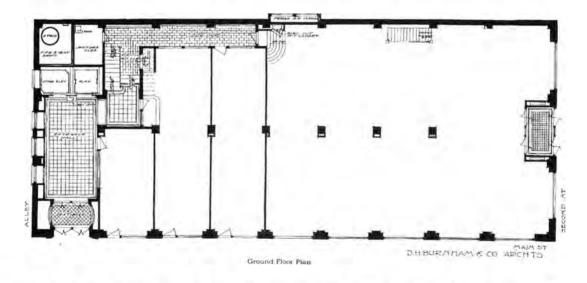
First story plan in June 1910 promotional booklet (Putnam Trust collection).
